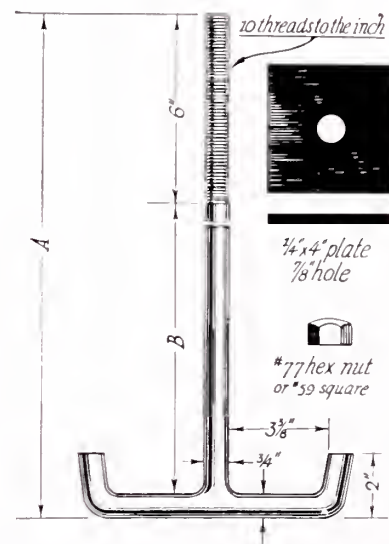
Special bolt with plate and nut, used in construction of forms for flat arch
